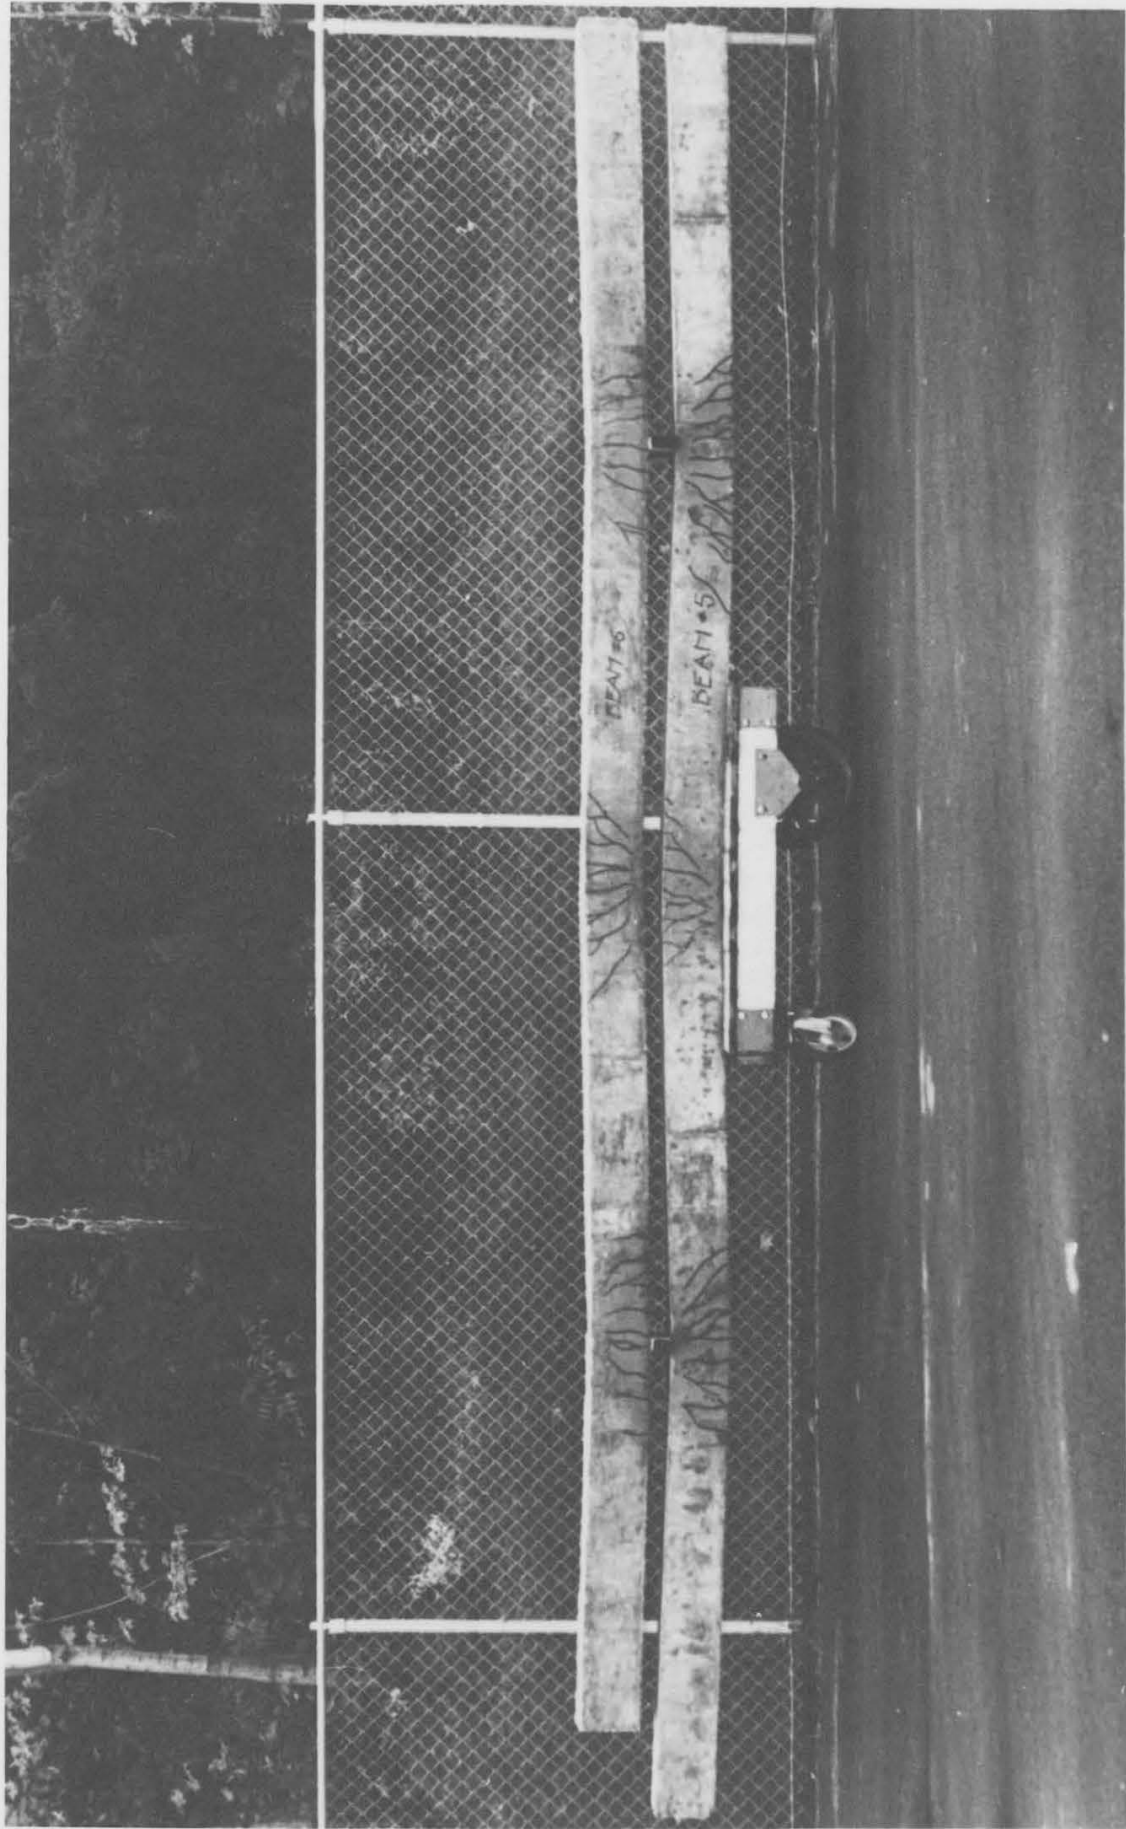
b. BEAMS #5 AND #6 AFTER TEST
